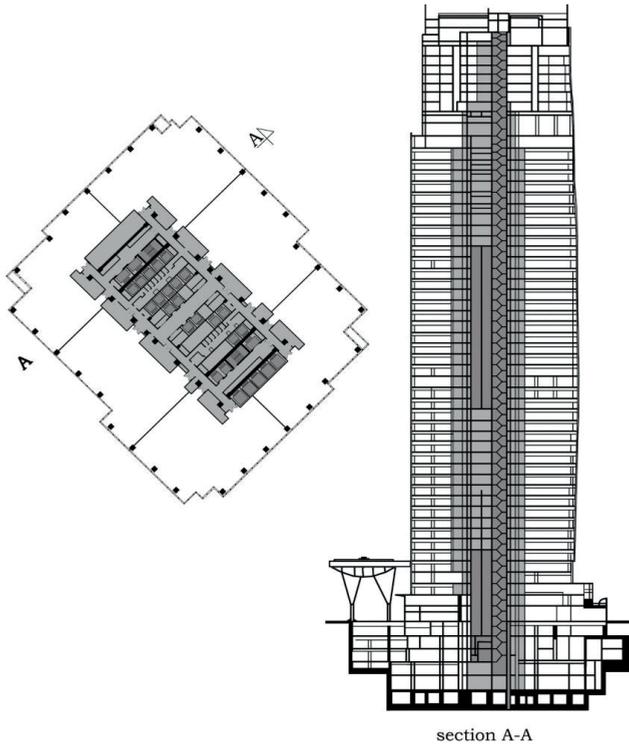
Midtown Tower: floor plan and section, developed by authors [11]
